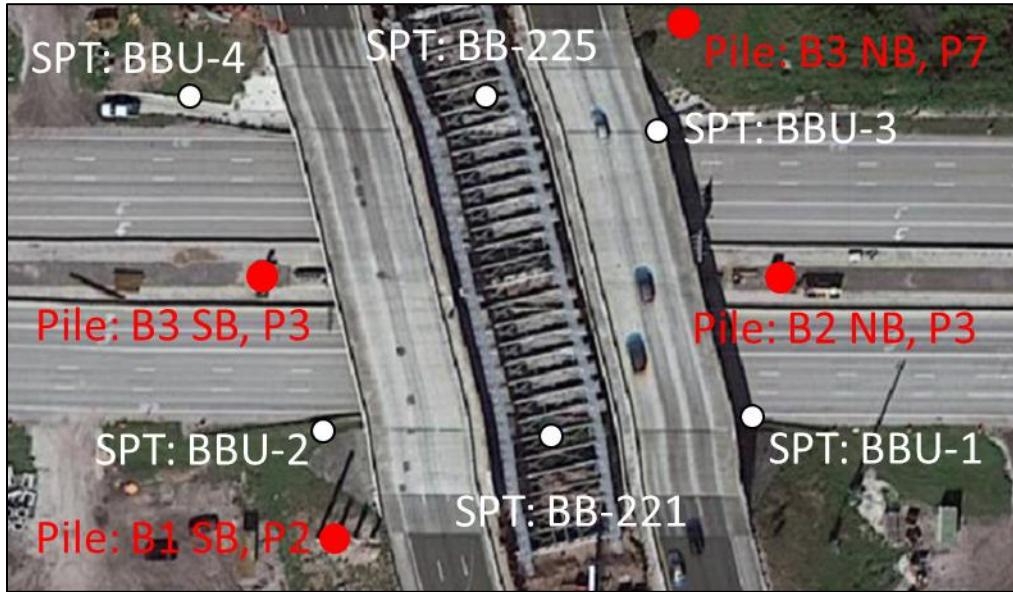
Test pile and SPT boring locations for I-75 over University
